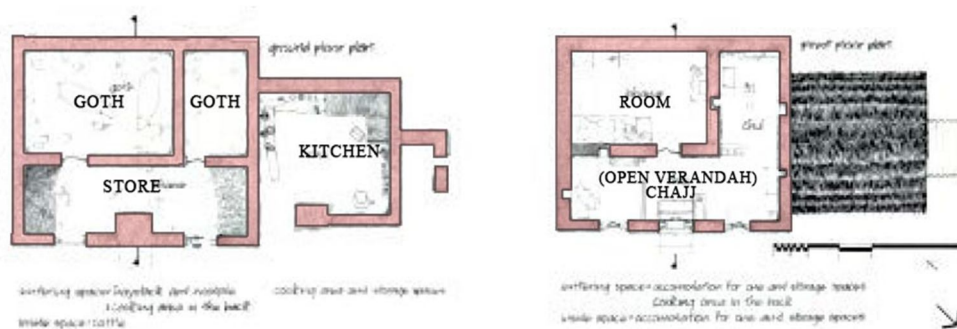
ground and first floor plan of Harkot village showing living space (Source: Report on traditional vernacular architecture of Kumaon)
